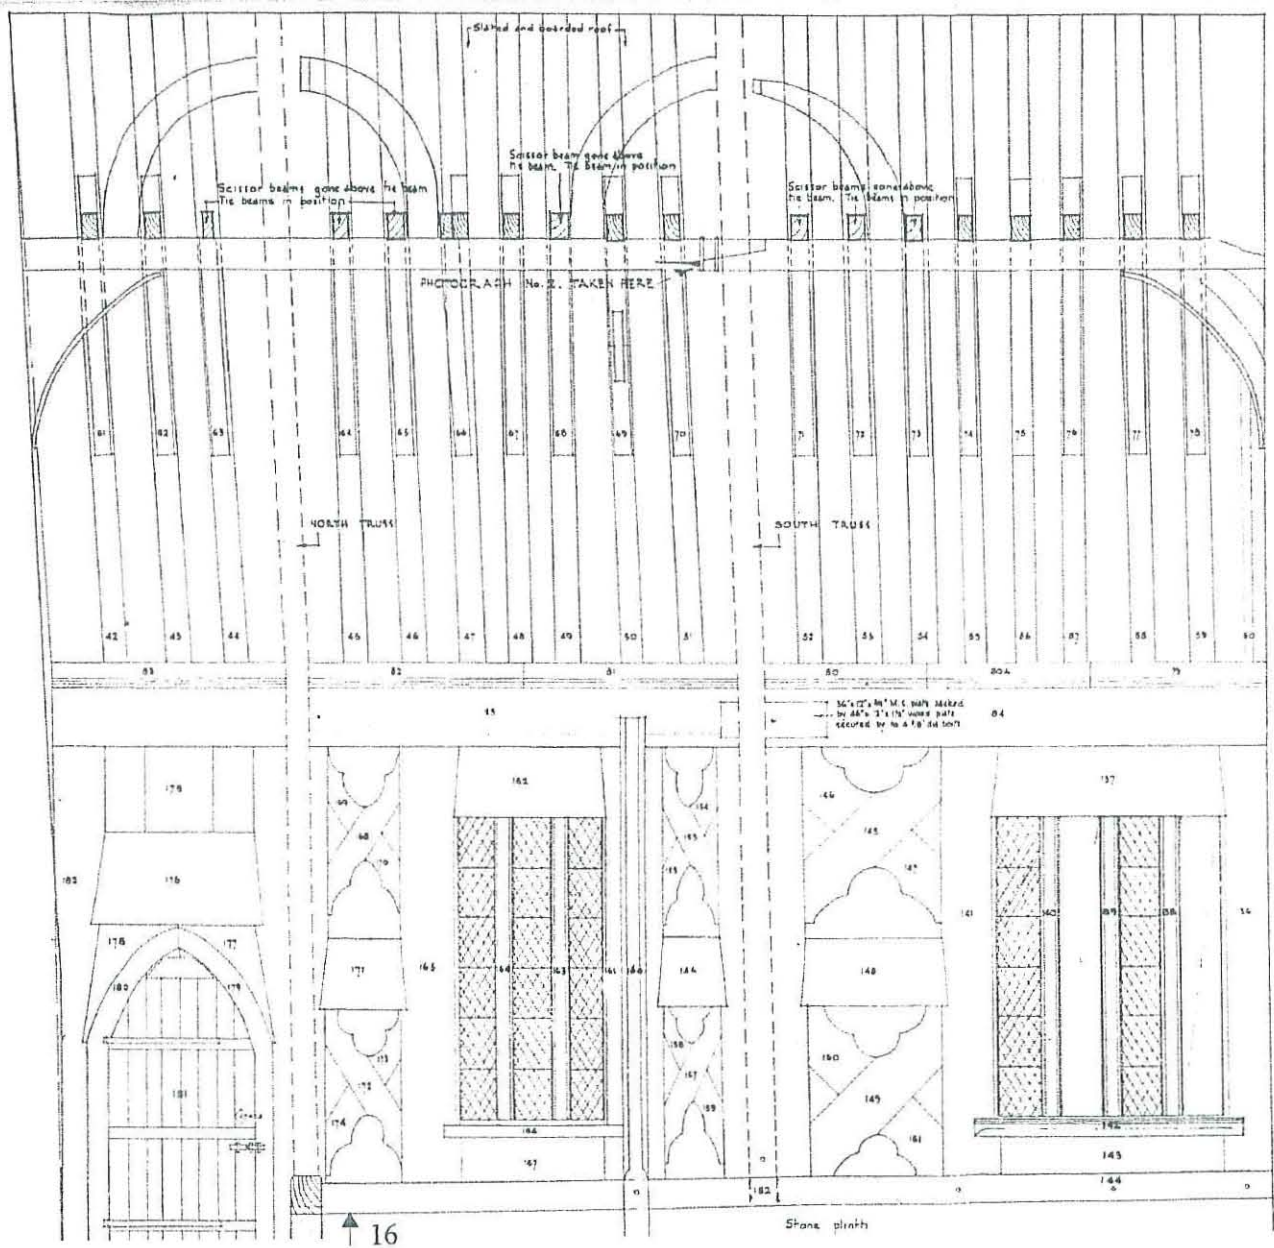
Internal elevation of east wall. Hall range, Baguley Hall. Location of sample 16
